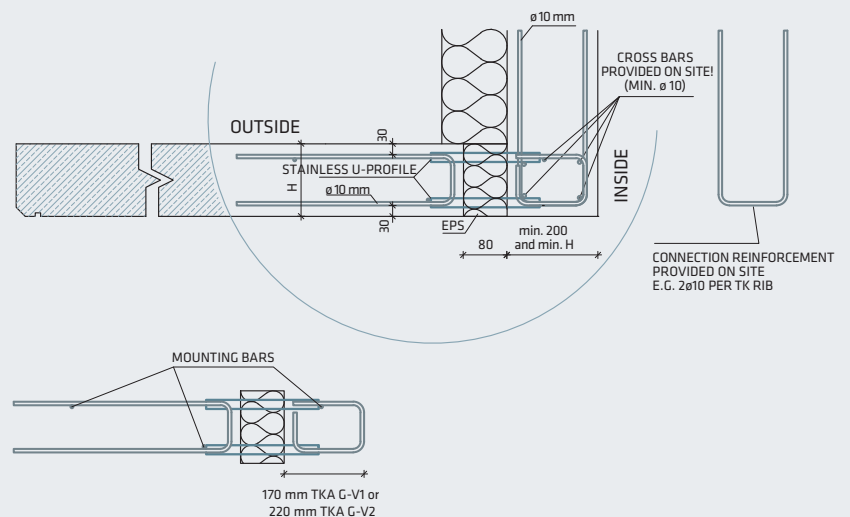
Balcony connection – wall above with TKA G-V1 or V2
